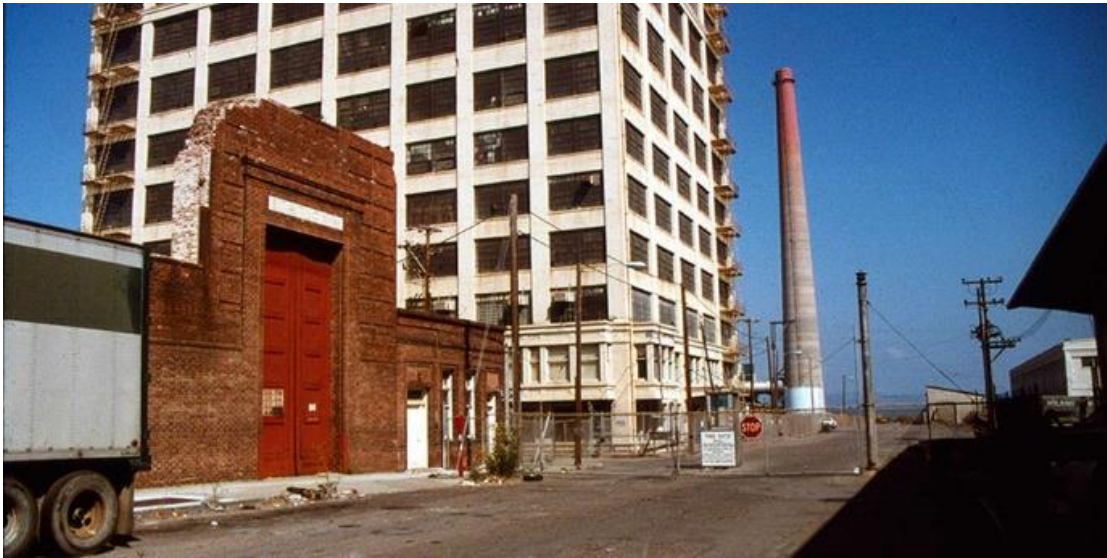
Station A Boiler Hall doors and Gate House, with Sugar House in the background (ca. Boiler Hall demolition in 1983). View looking northeast. Source: Associate Capital.
